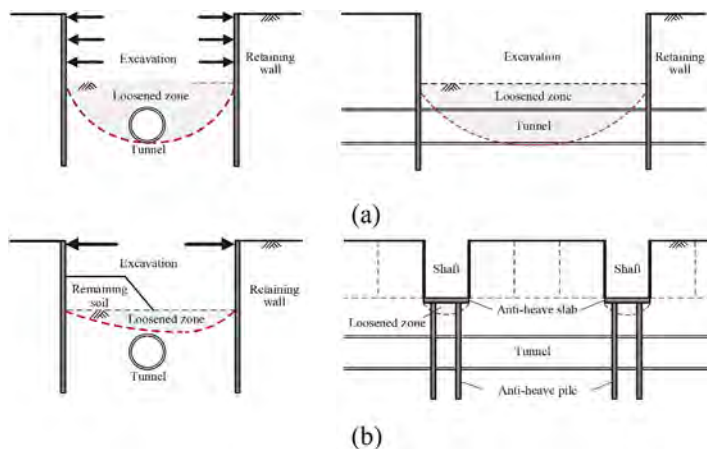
Countermeasures for controlling development of loosened zone: (a) regular excavation in cross section and longitudinal section; (b) remaining soil and spaced shaft excavation with anti-heave structure.
